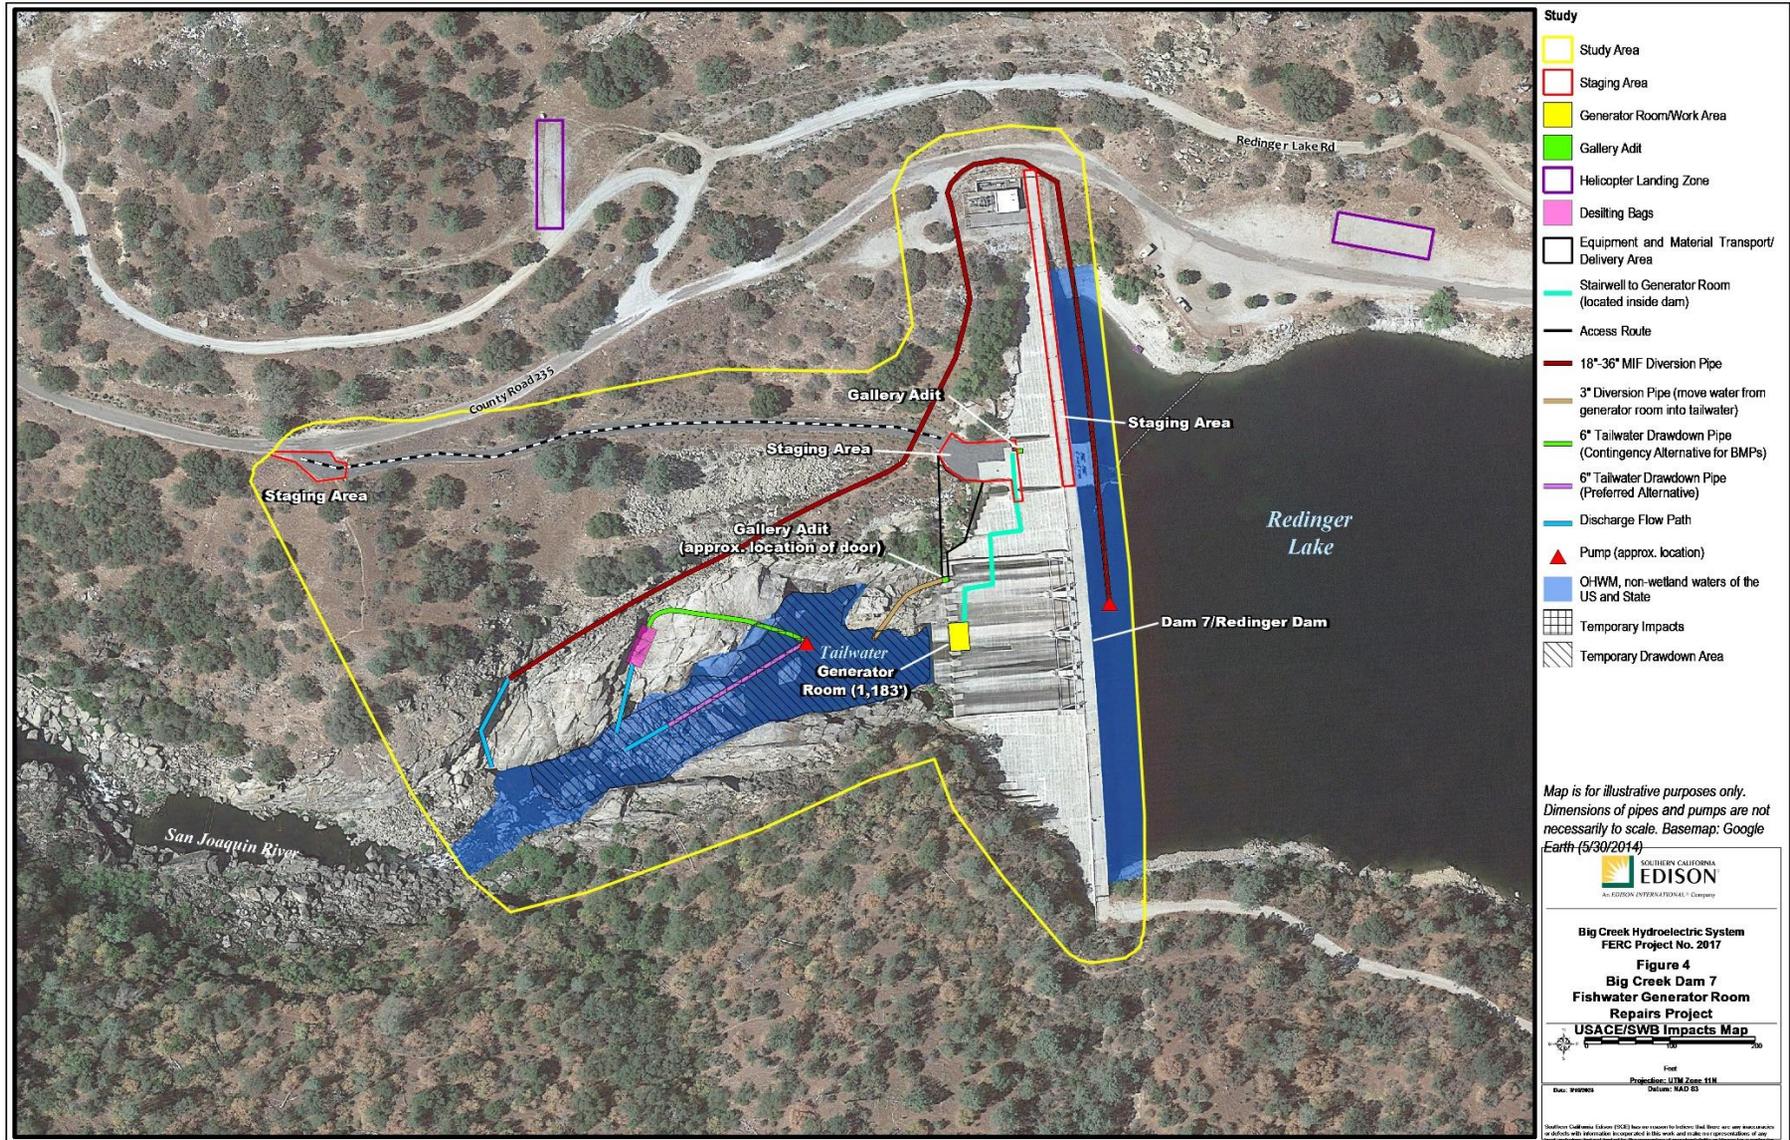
Aerial View of Big Creek Dam No. 7 Fishwater Generator Room Repairs Project (SCE 2023)
